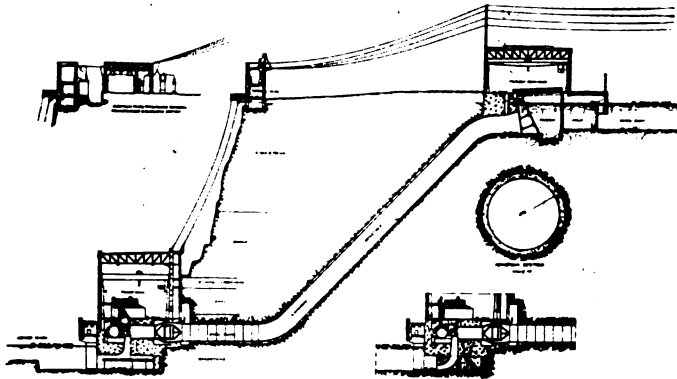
CROSS-SECTION—STATION No. 3 EXTENSION, EXISTING AND PROPOSED
